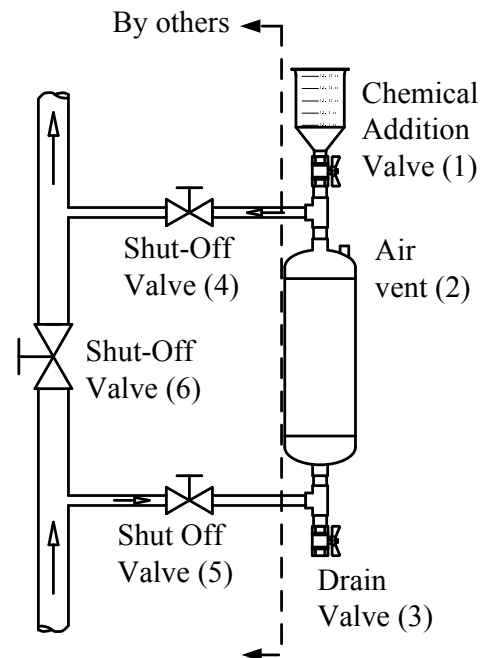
Installation method 2 – CBF installed in parallel with the system piping
